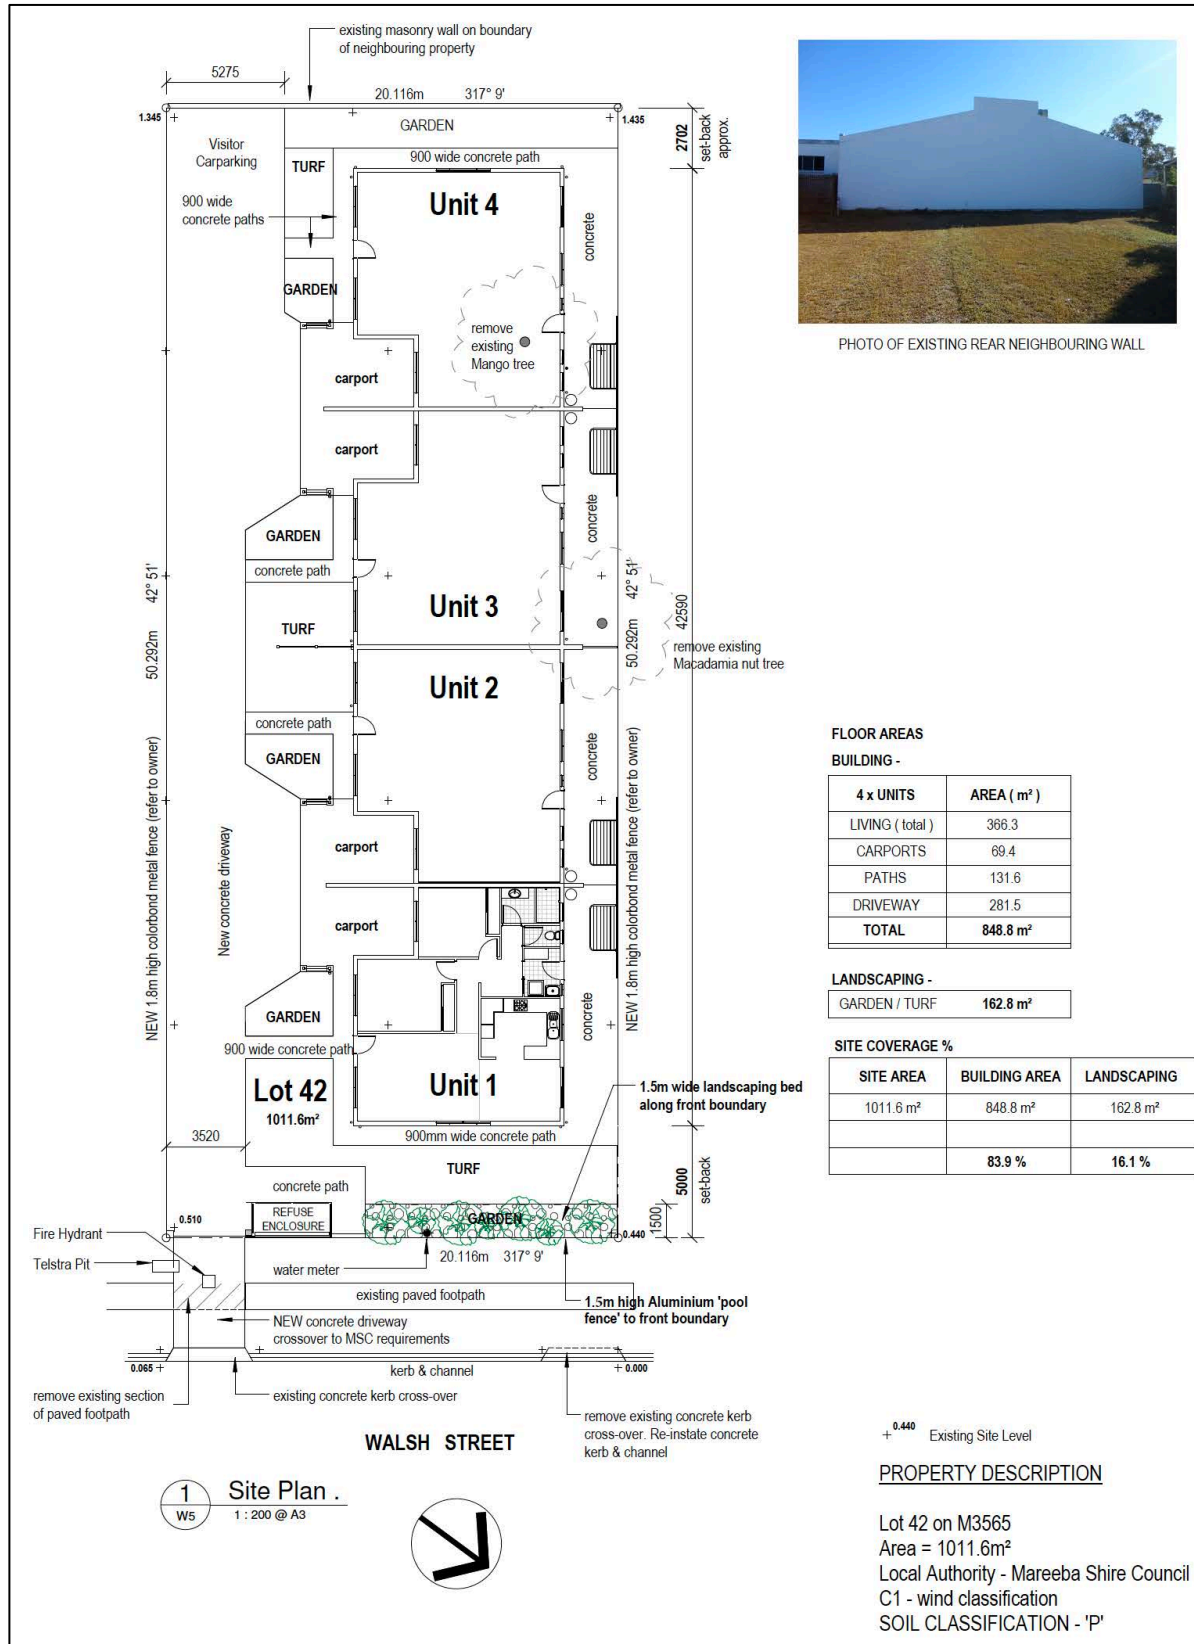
Extract from Site Plan (Prepared by Allan Ballard)
